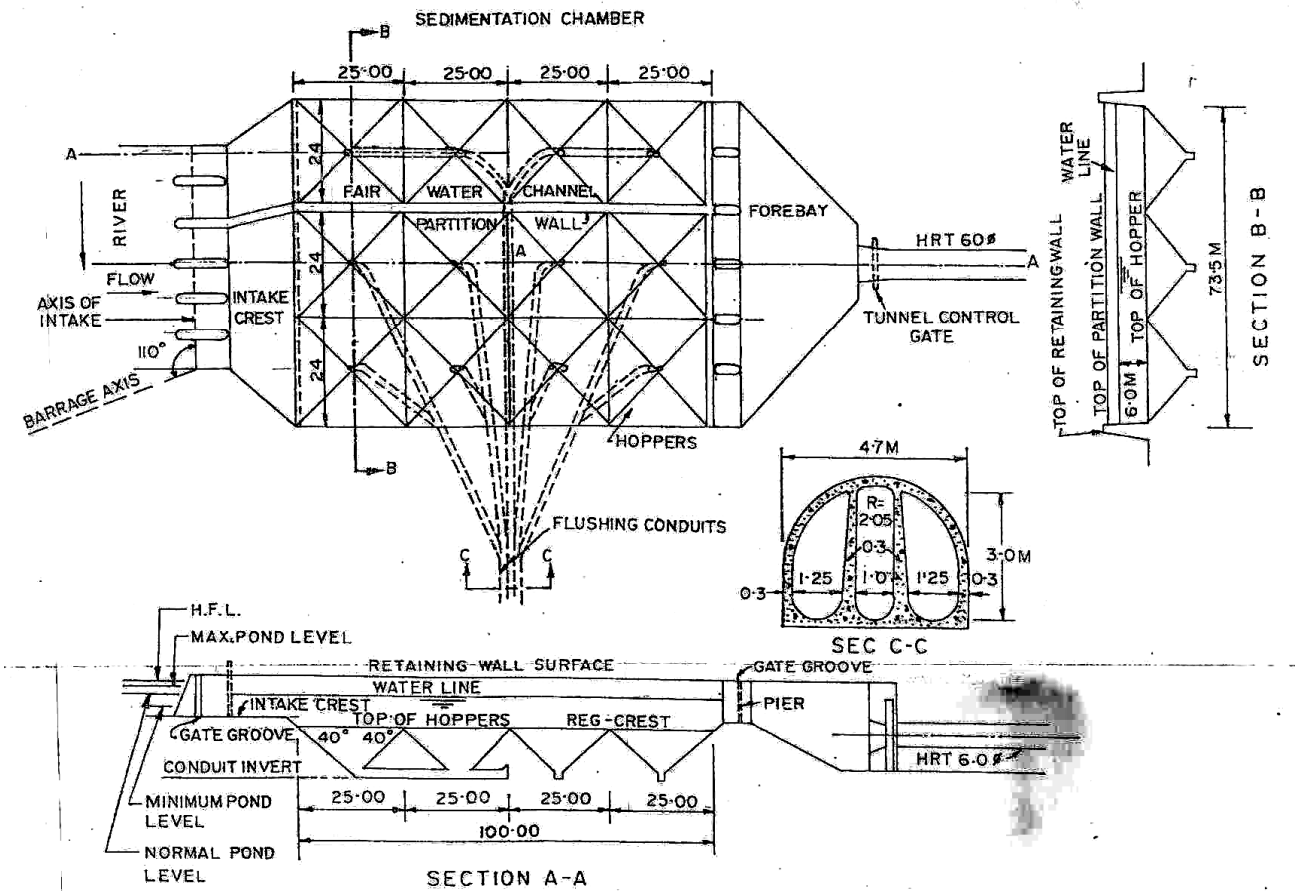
PLAN OF SETTLING BASIN AND HOPPER TYPE EJECTOR
